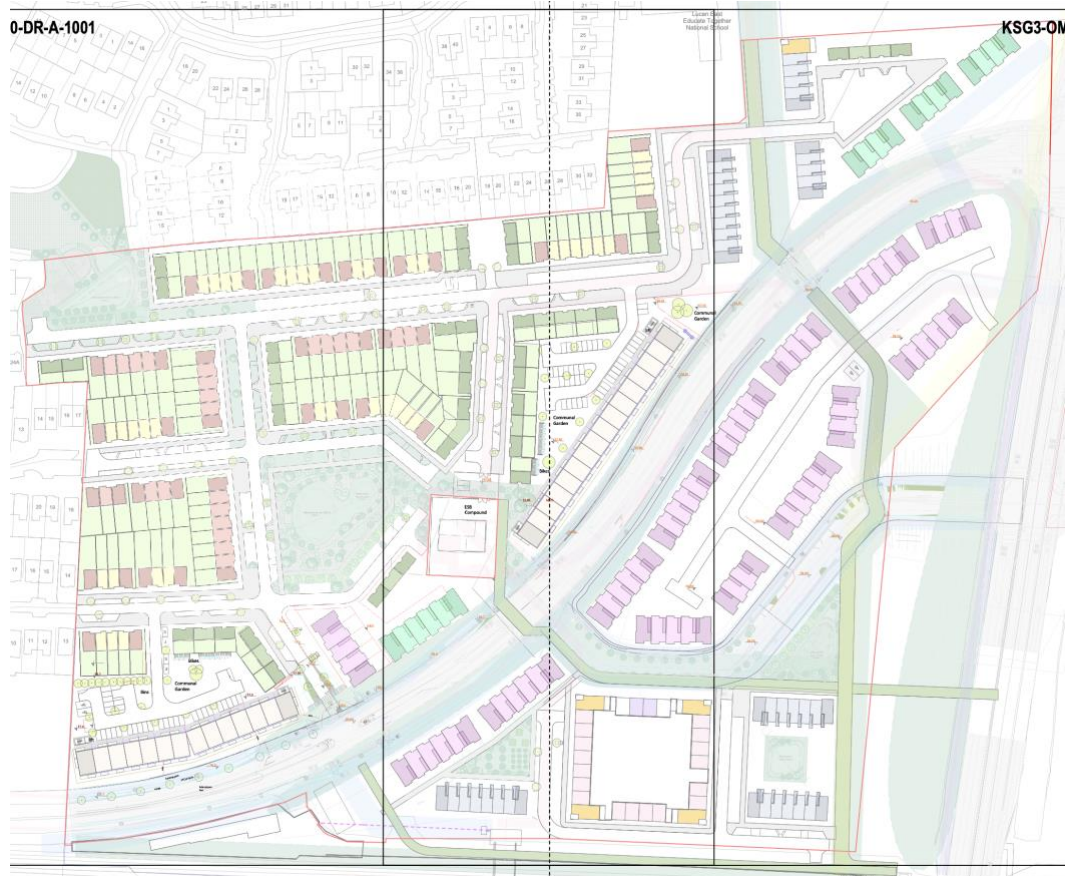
Site Layout Plan (Site 3) at Section 247 meeting held on the 26 June 2024 with application areas outlined in red
